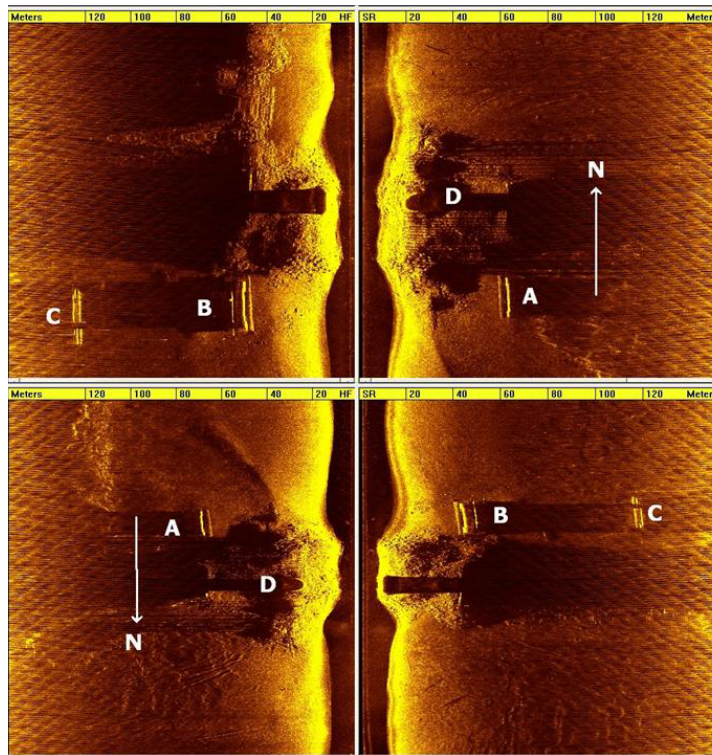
View of the bridge piers. Right panel shows the side scan sonar image near pier B and C.
